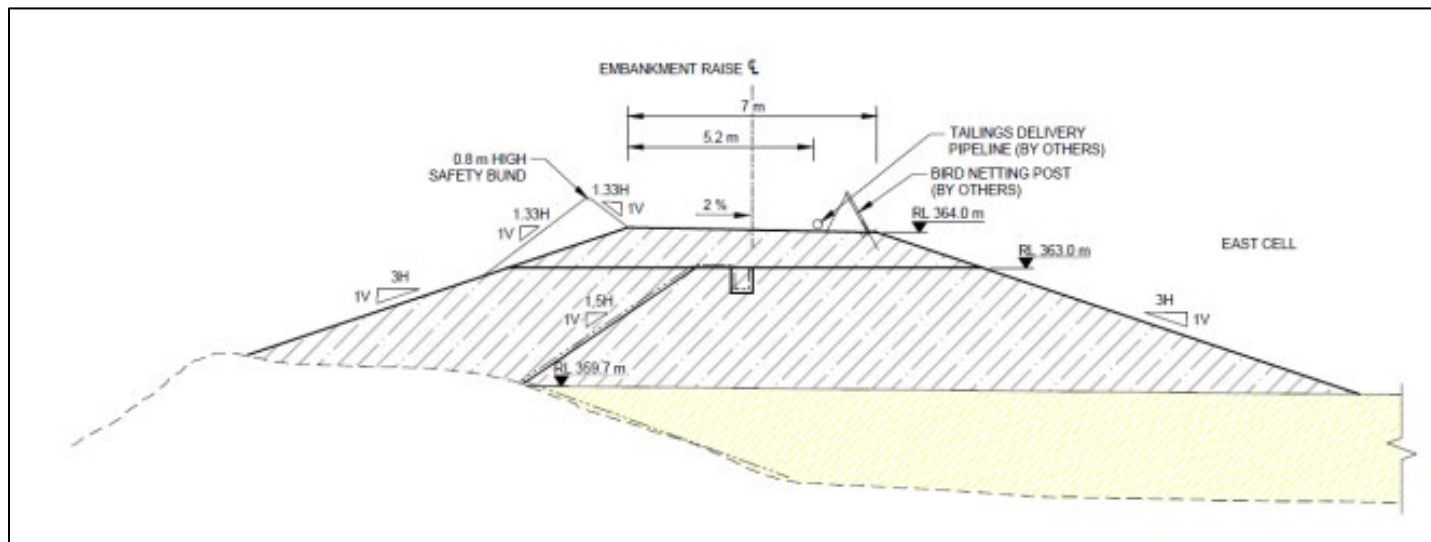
Gidji II typical cross section of 4m high upstream wall raise on Gidji II TSF (with liner detail;2022)
